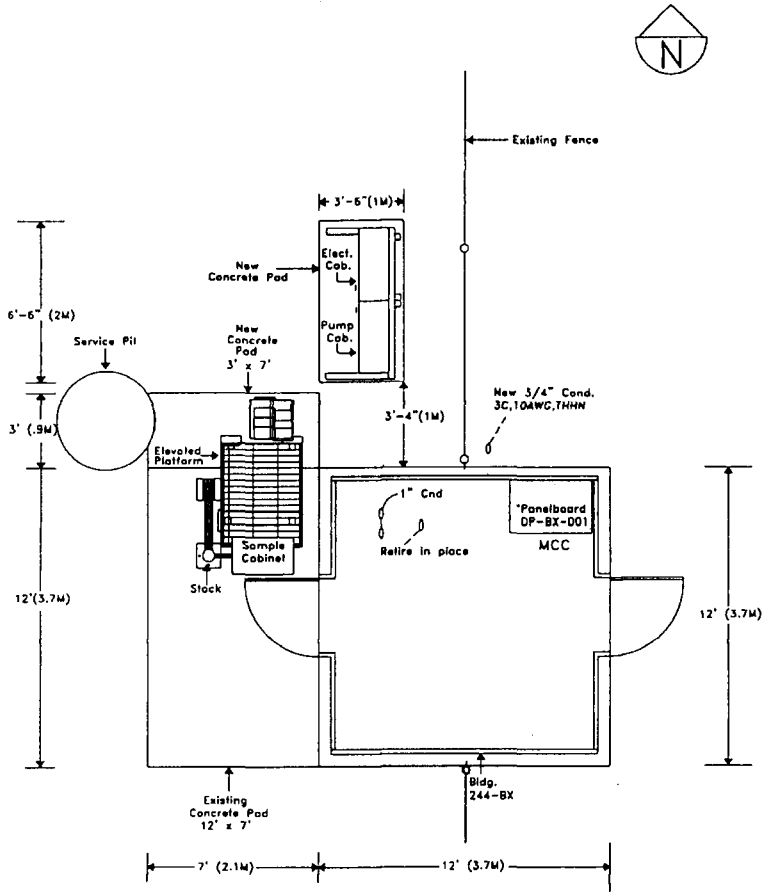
244-BX DCRT GEMS Upgrade - Plan View of Equipment Layout
